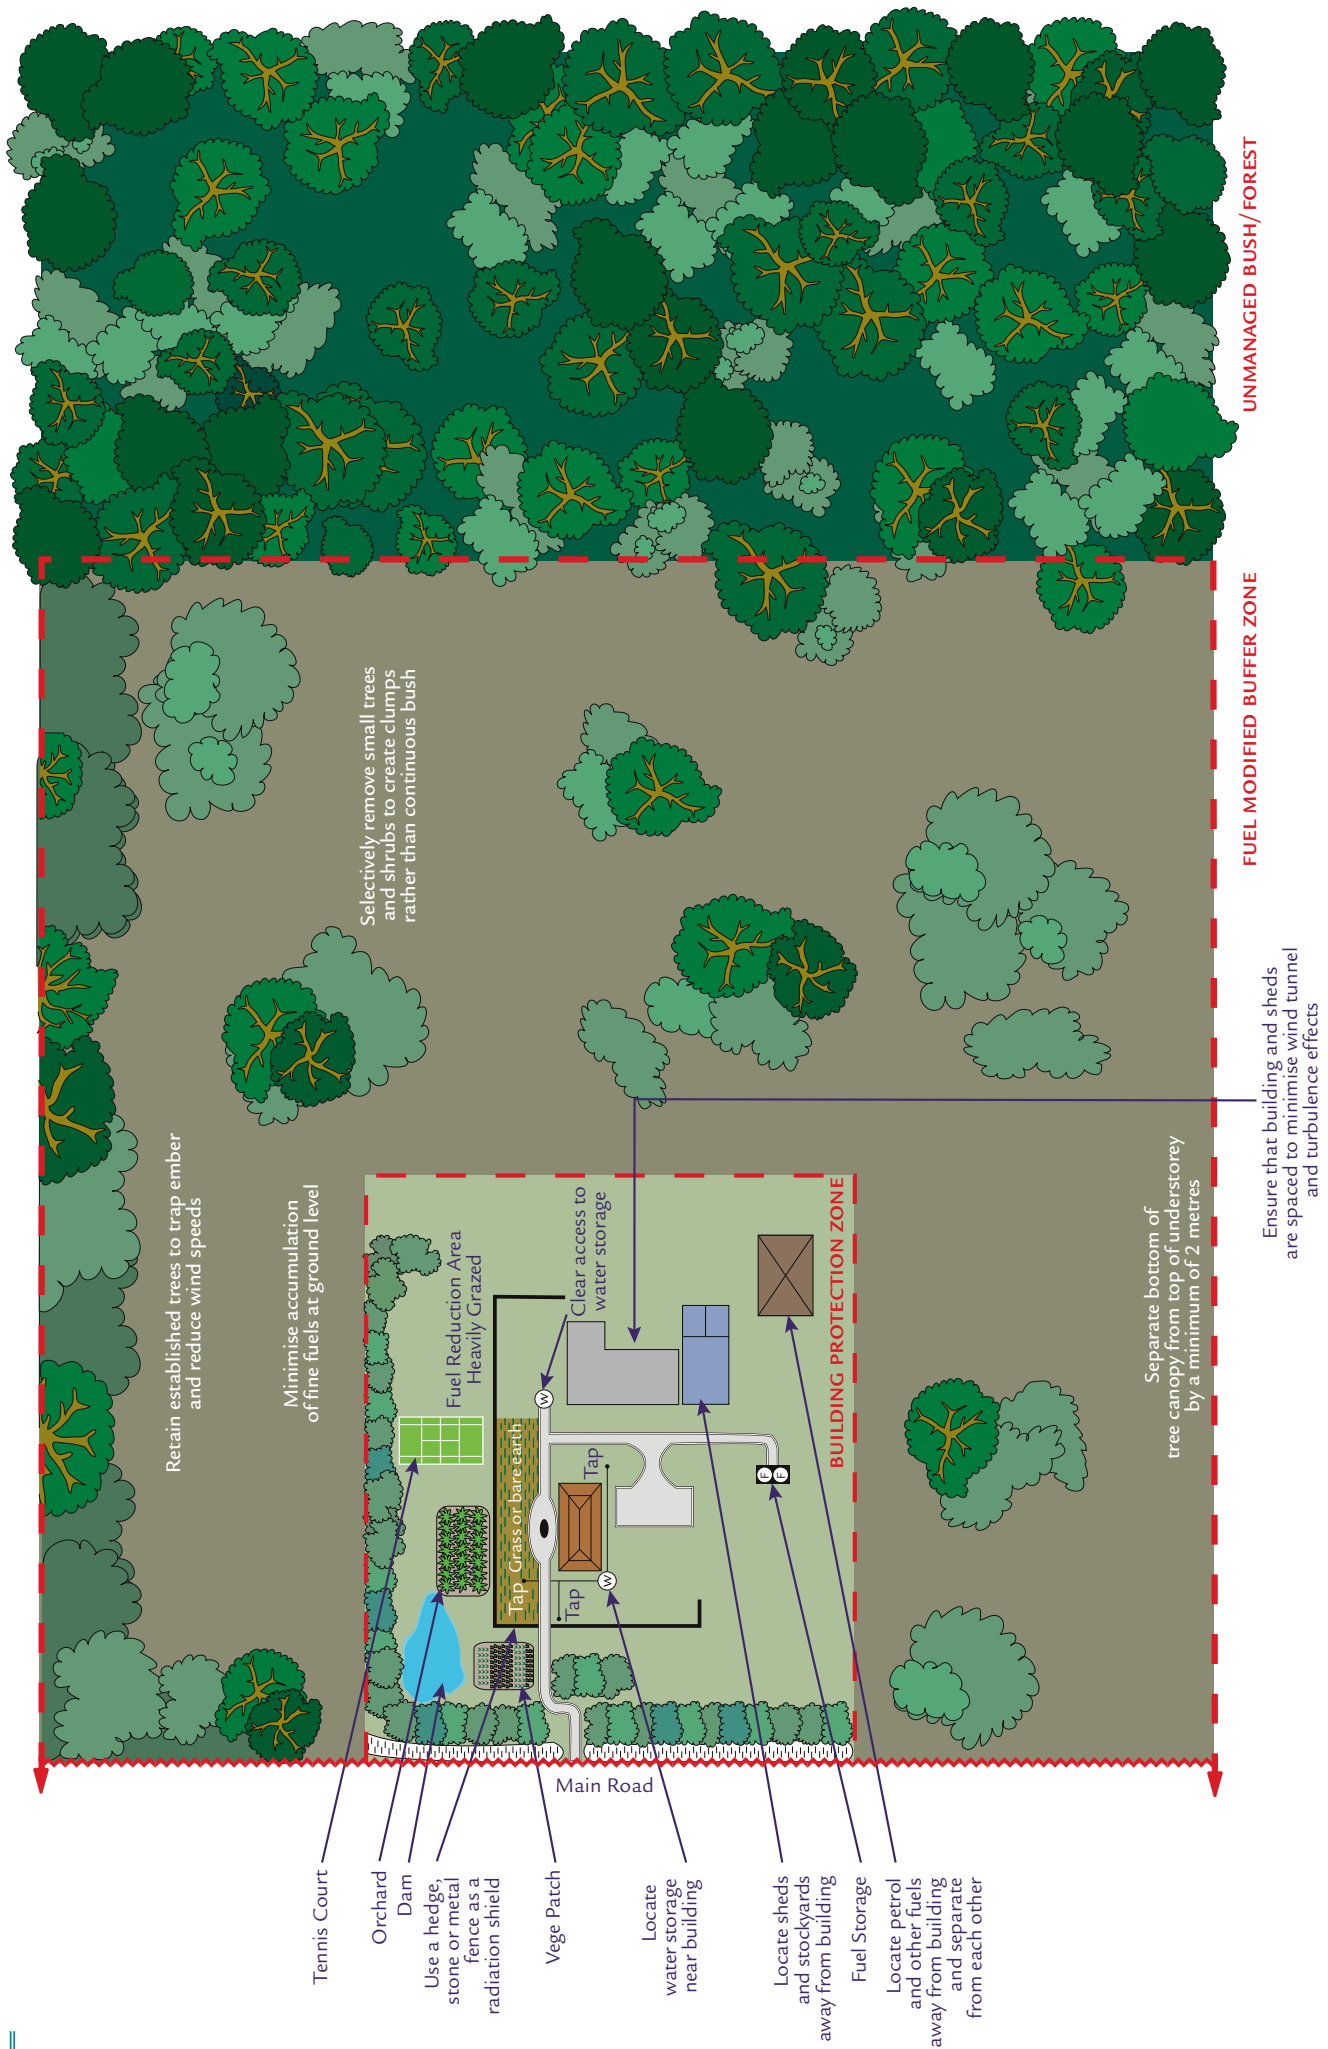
Lot layout for a house in a bushfire prone area showing the building, the Building Protection Zone, the Fuel Modified Buffer Zone and the bush beyond the fuel managed areas.
